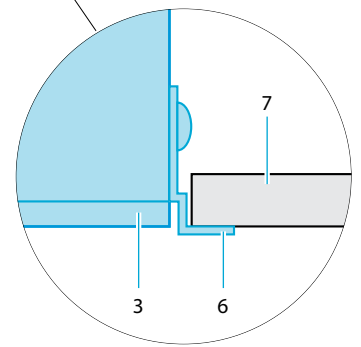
Filtrasept ceiling outlet, mounted in false ceiling
